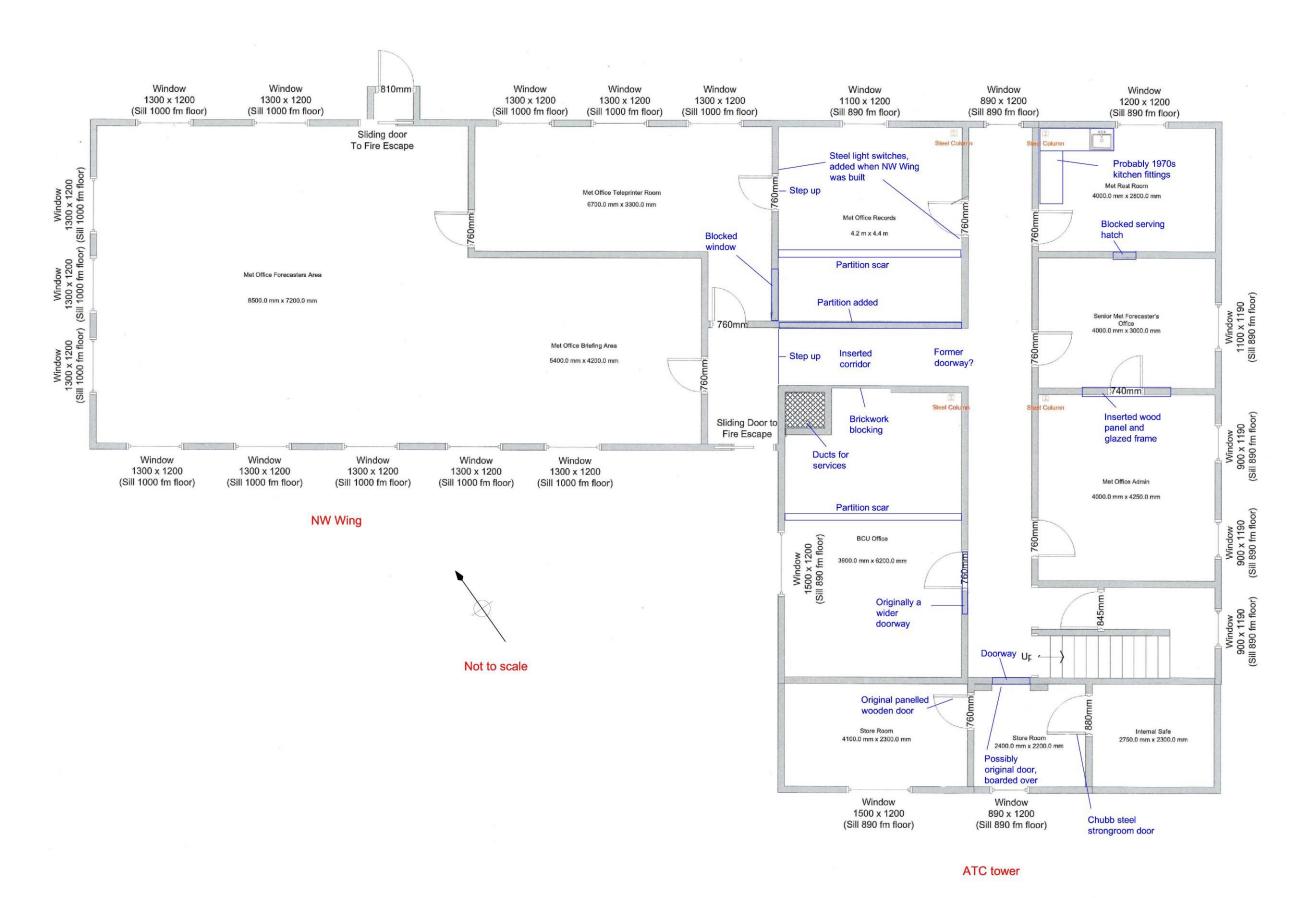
First floor plan of the former RAF ATC tower and NW Wing
